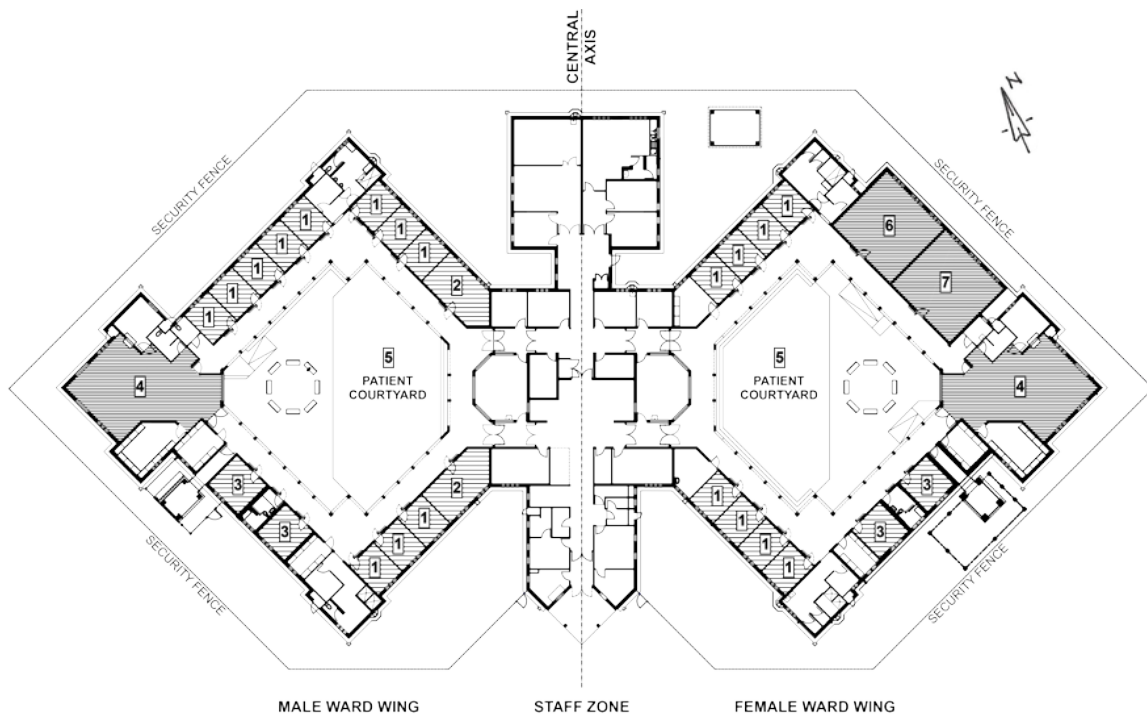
Adapted Diagram from Osmond Lange Architects and Planners. Author's Own, 2016.
